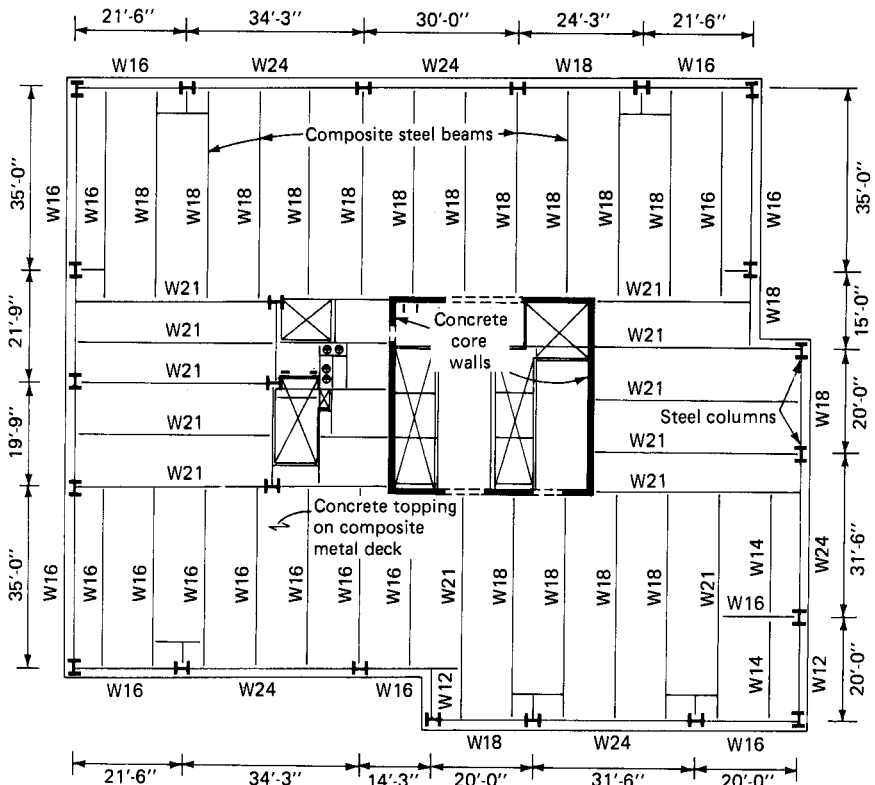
Typical floor plan of core structure with steel surround. (Courtesy of Steve Ball and Heinz Winkles of Ellisor & Tanner, Inc.)
